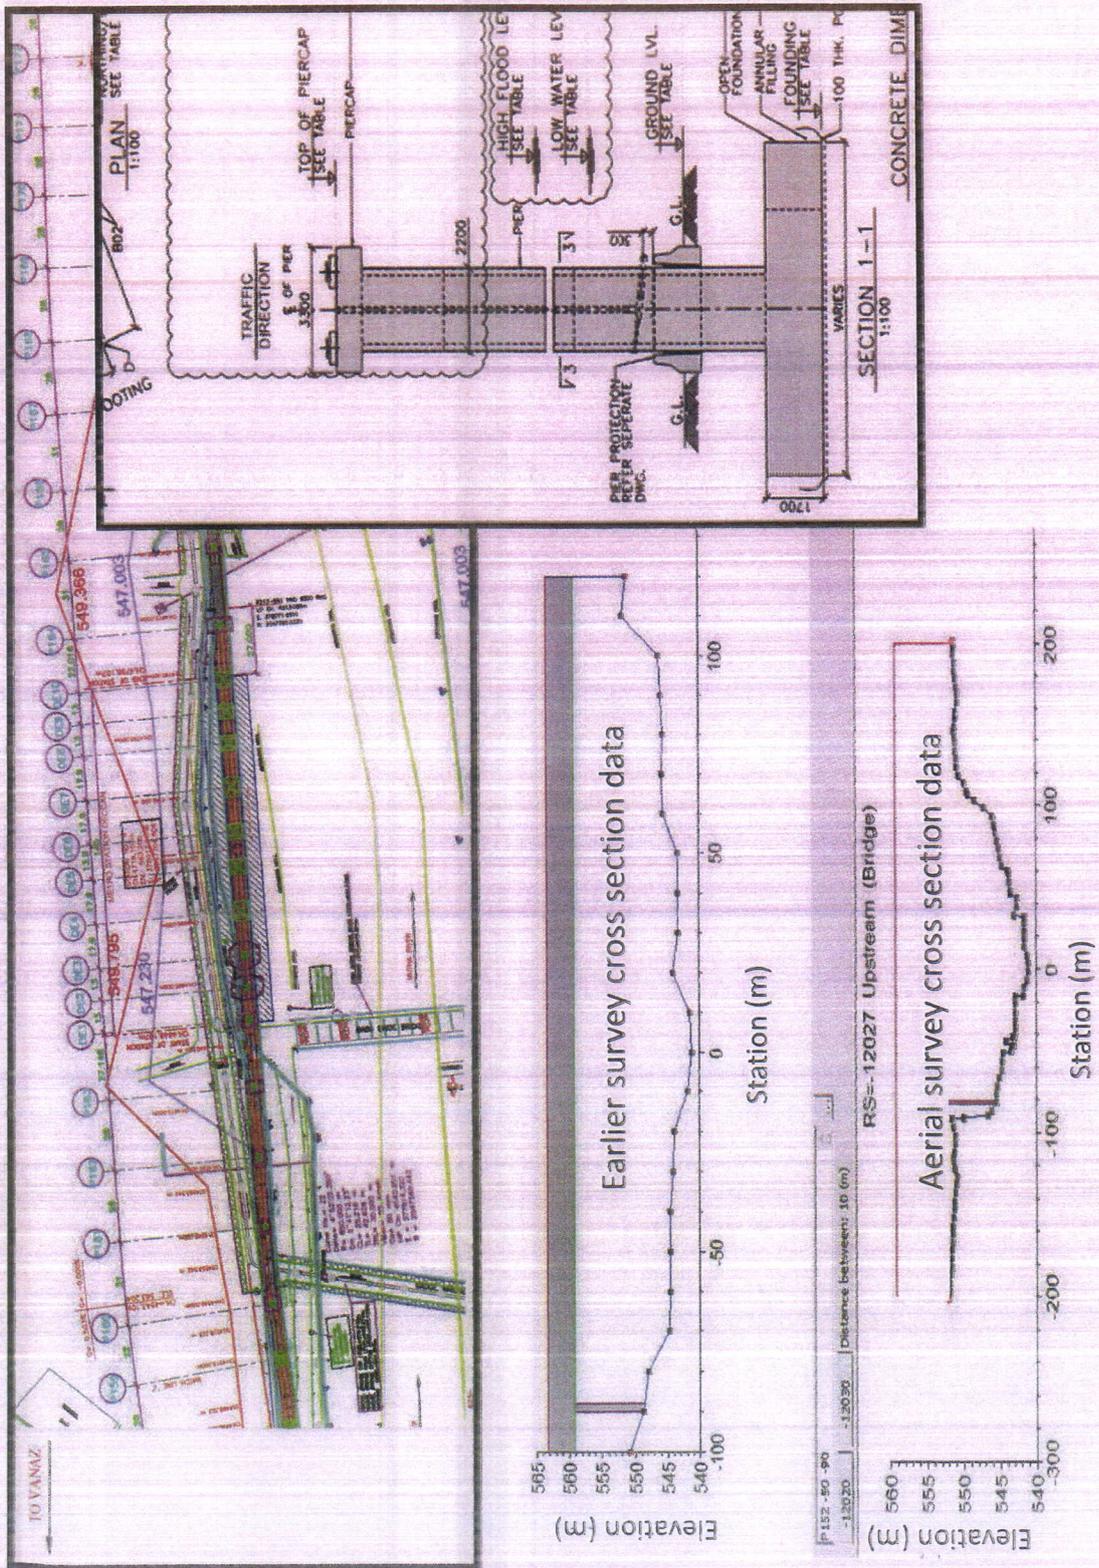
Sample Data Metro pier (P152) near Sambhaji Bridge
